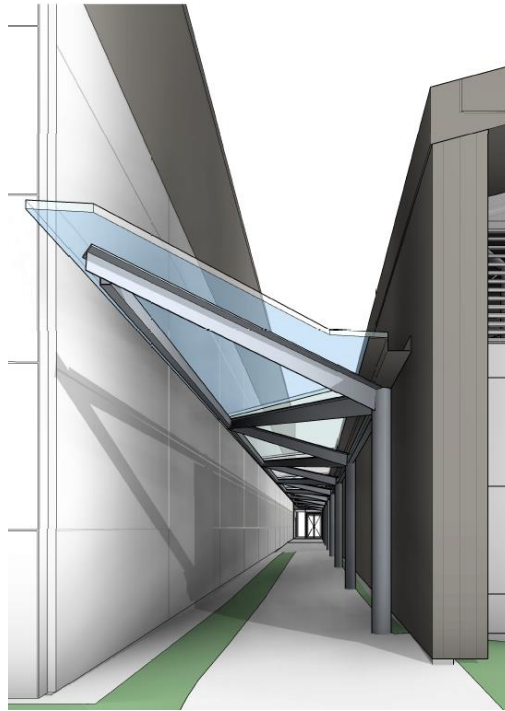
Awning Structure between Site and Adjacent SISC Building. View North (Source: CM+)
